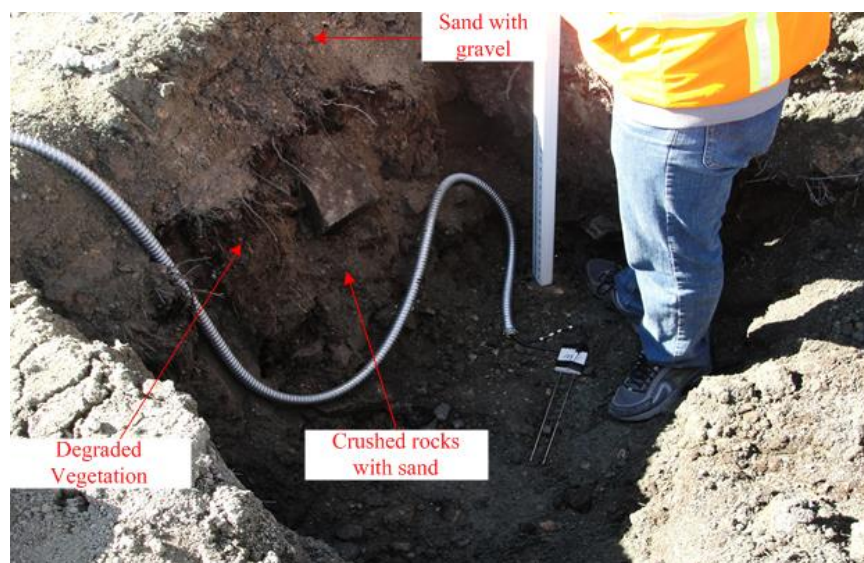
Excavation of Pit at Center of Road (Sensor 13)
